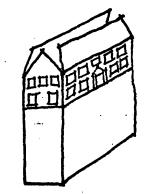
HOW THE BUILDINGS WERE CONSTRUCTED
